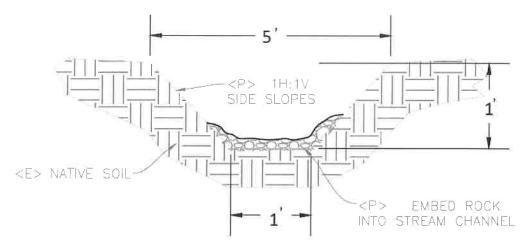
latitudinal cross section of proposed channel excavation on upper and lower areas (channel will gradually taper to these dimensions
